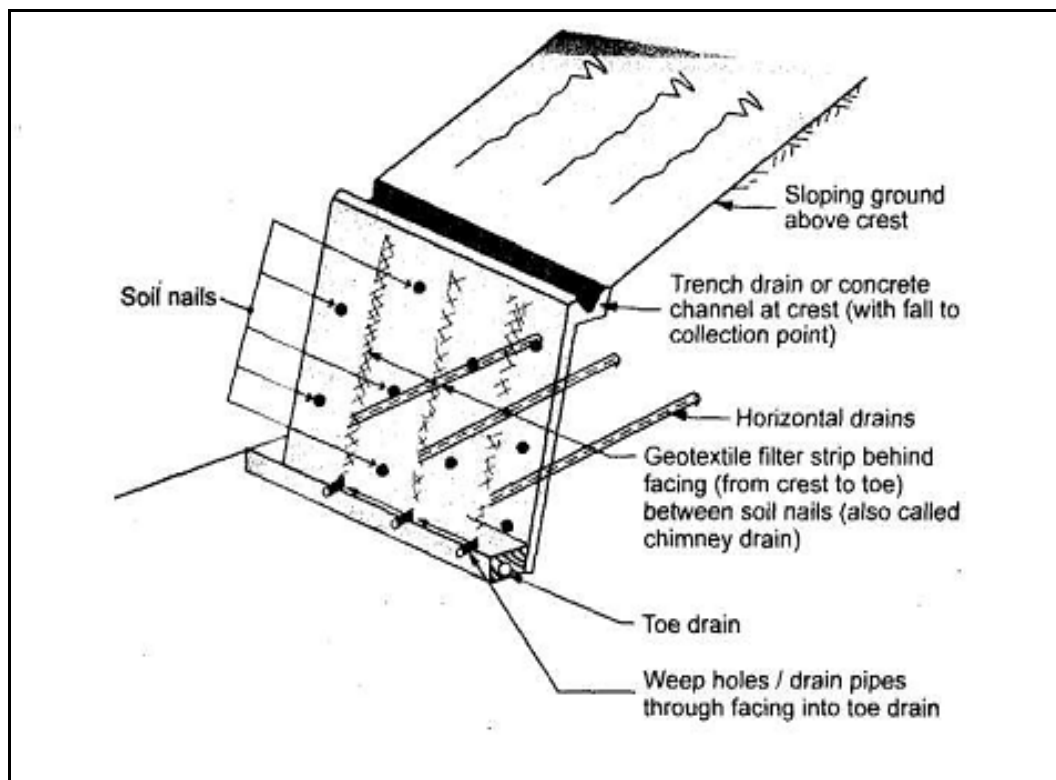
Typical types of drainage for soil nailing (Phear *et al.*, 2005)
